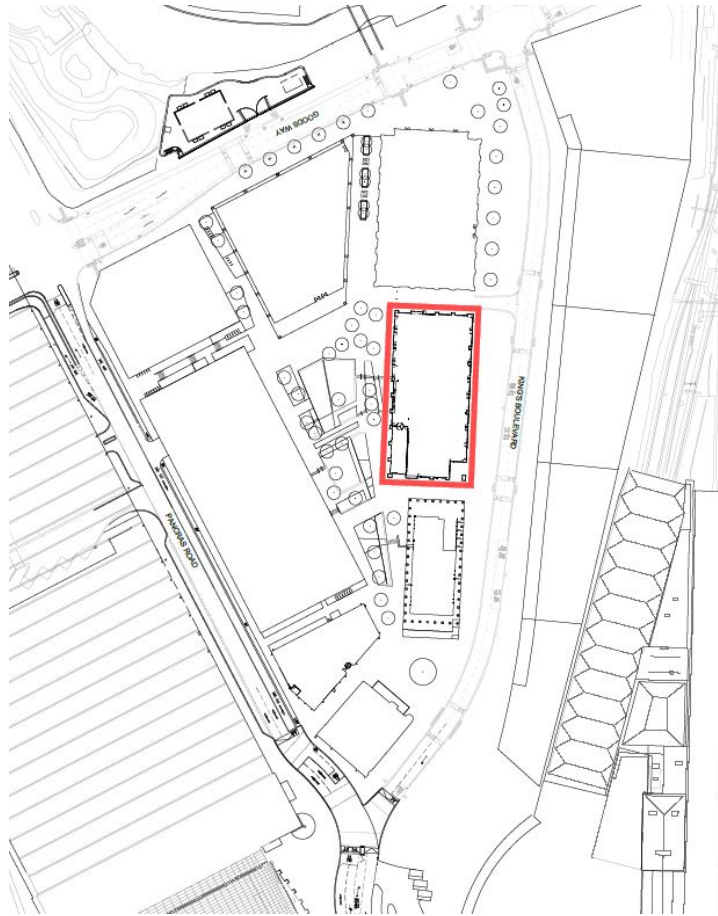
Extract from Location Plan ((20)XXX-1-01)
